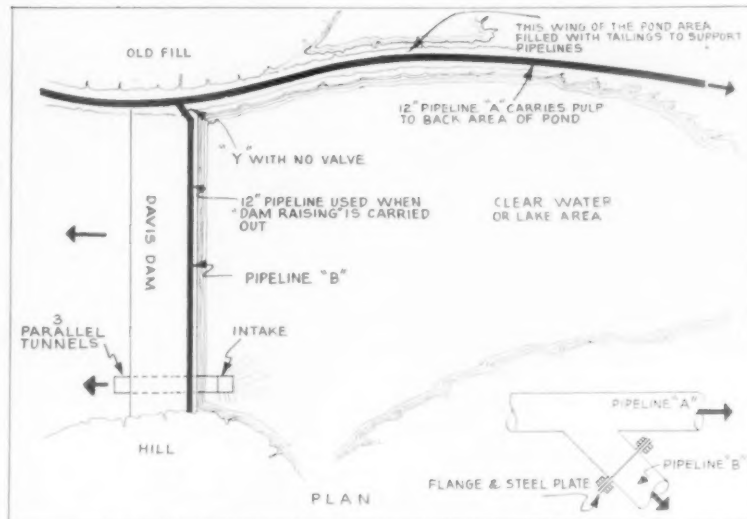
General layout of dam and tailings pipelines. When pipeline "B" is used the steel plate over the Y-connection is removed so that tailings will flow out over the top of the dam to be used in building it higher. The sketch in the lower right shows the Y-connection.
